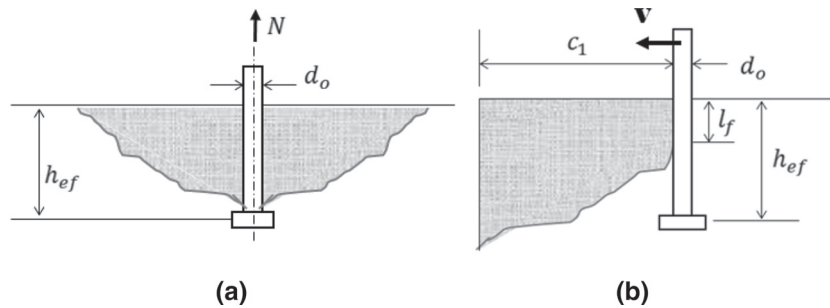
Size effect on concrete failure due to tensile and shear loading. a Concrete cone failure in tension. b Concrete breakout failure in shear.
